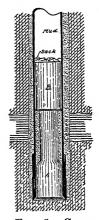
Casing Set on Bottom. Cementing Completed.
